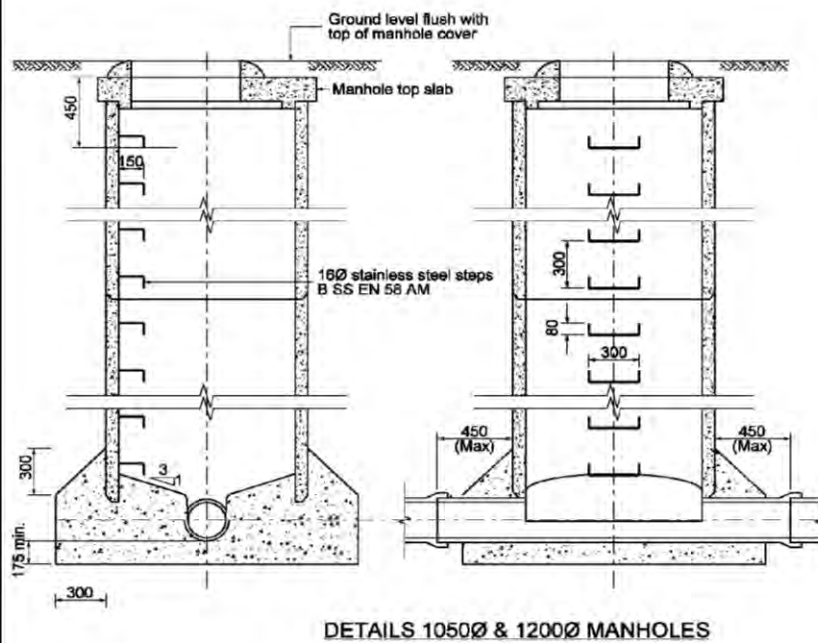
TS 400.2 New manhole on existing line (sheet 1)
